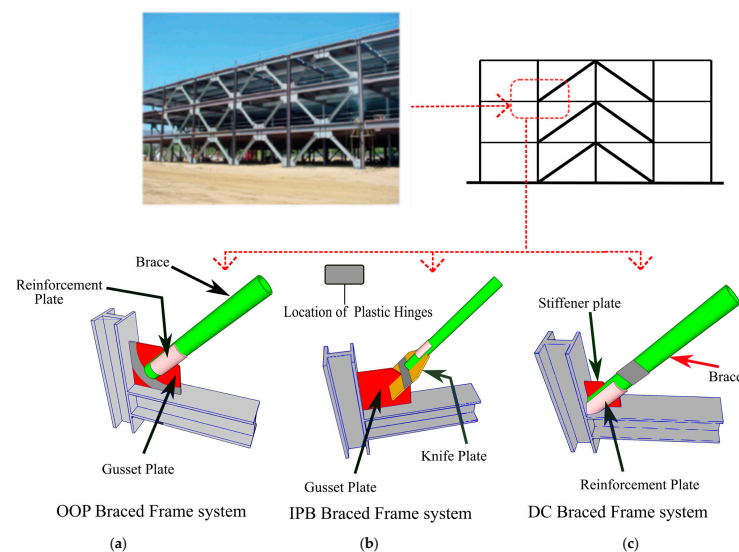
Connection detailing of (a) out-of-plane buckling (OOPB), (b) in-plane buckling (IPB), and (c) direct connection (DC) braced frame systems.
